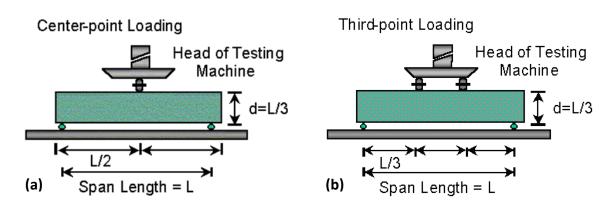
Flexural Strength Tests (a) Simple Beam with Center-Point Loading (ASTM C 293) (b) Simple Beam with Third-Point Loading (ASTM C 78)
